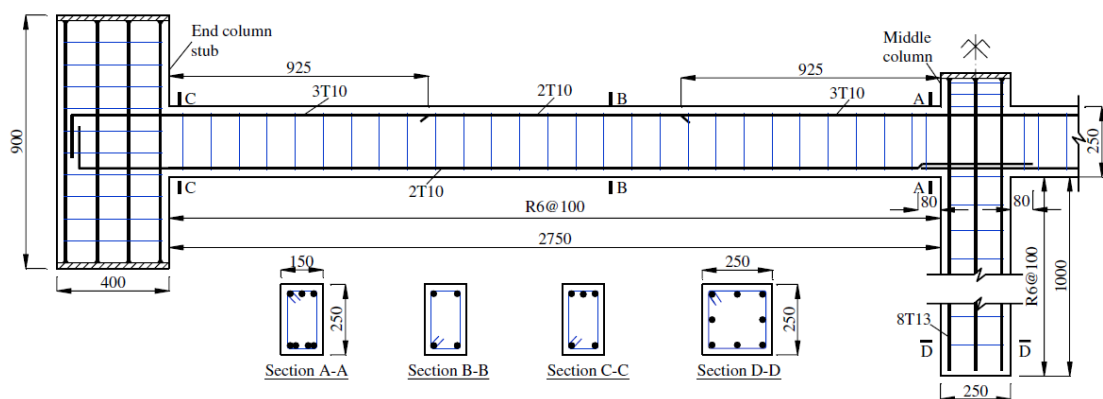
Specimen detailing, (unit: mm) (Yu et al 2014)
